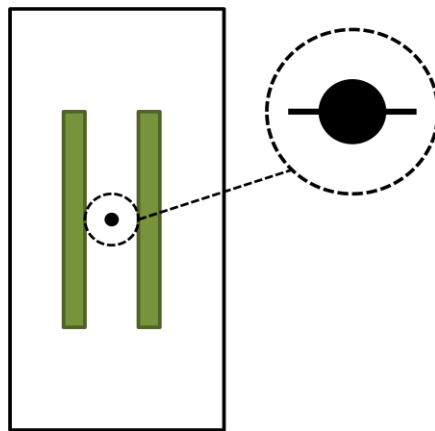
Notched hole steel plate specimen reinforced with FRP laminates
